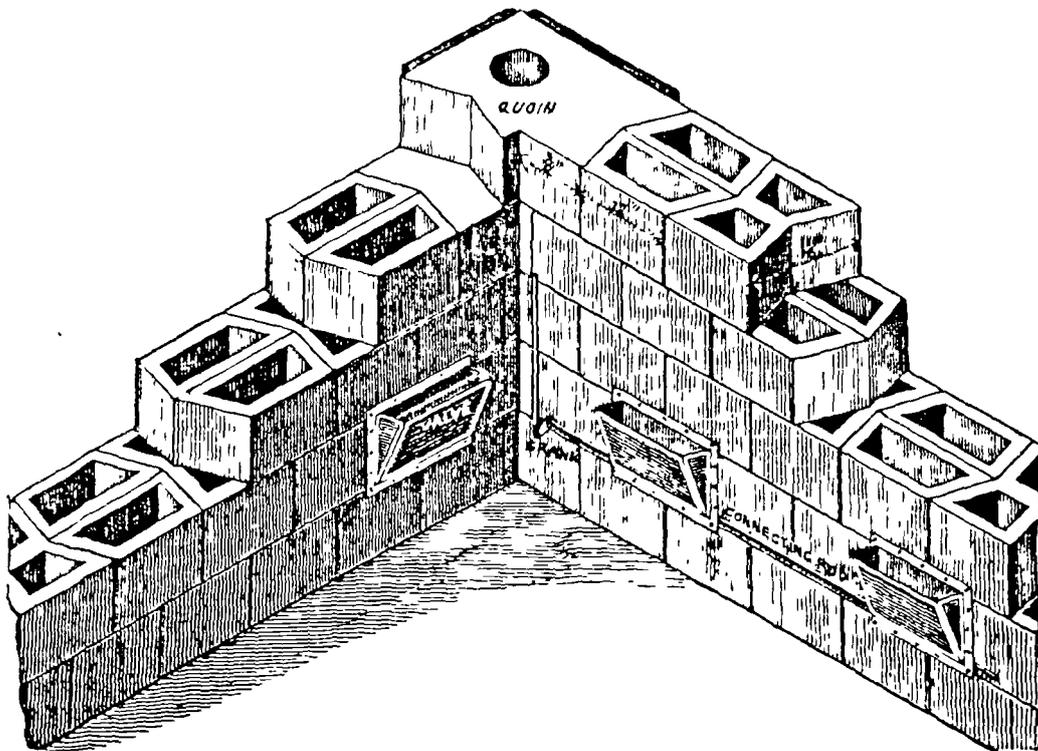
Construction of a concrete wall in stables and coach house at Hershams Lodge, Walton, Surrey using facing bricks manufactured by the Broomhall Tile Company. [From The Builder (1868) p. 658]
